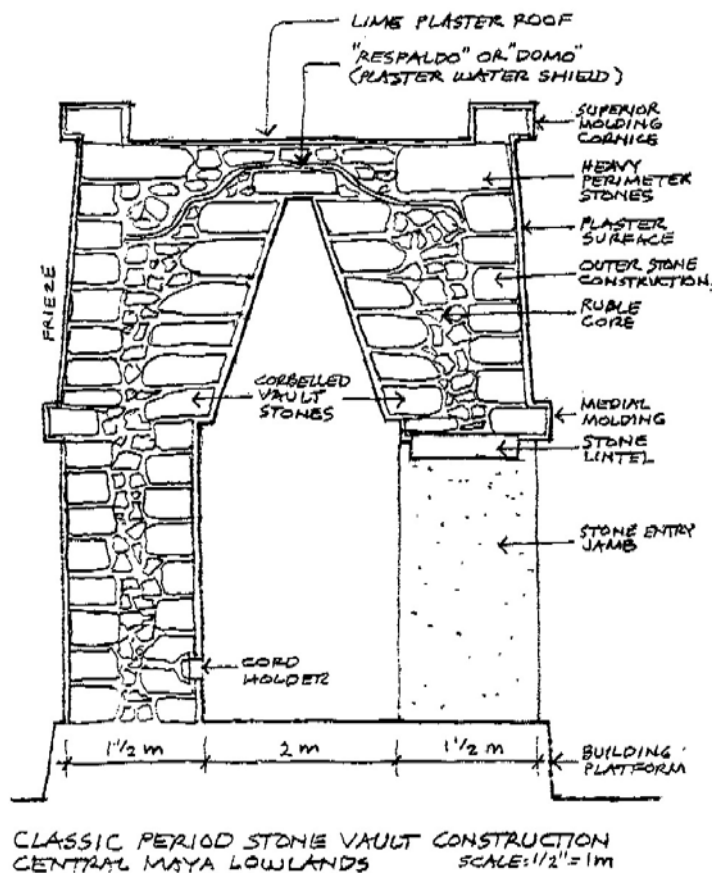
Maya stone vault construction (drawing by Paul Bailly for the BRASS/El Pilar Program).
